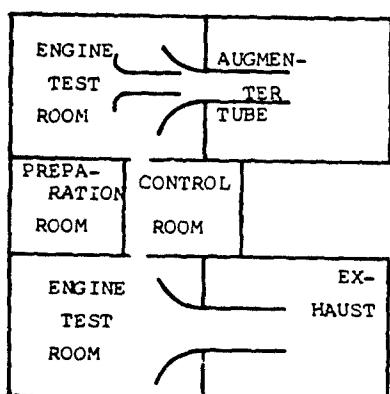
LAY-OUTS OF THE TEST- BUILDINGS
